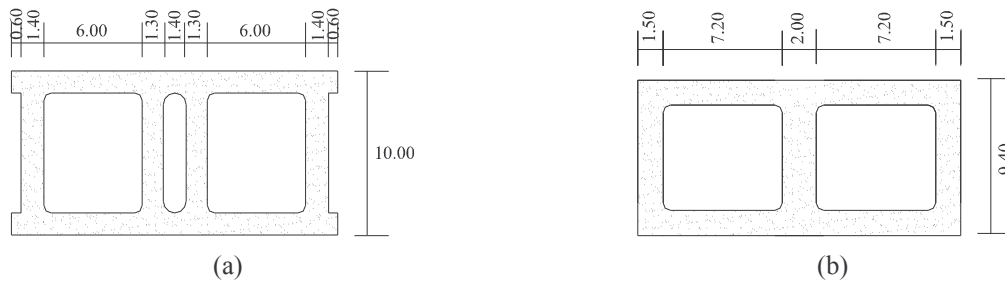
Concrete blocks that will be used in masonry panels; (a) Block 1: two cells; (b) Block 2: 3 cells.
